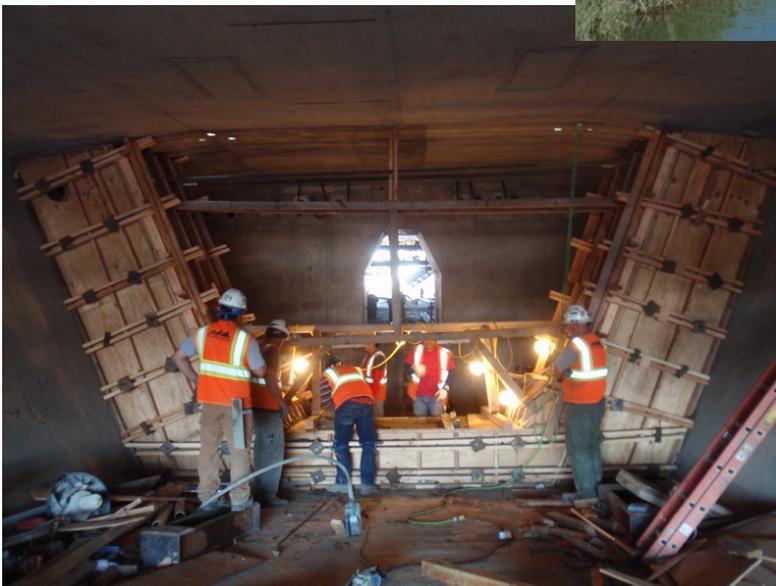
Pier 5 EB Column Construction – June 6, 2010:
